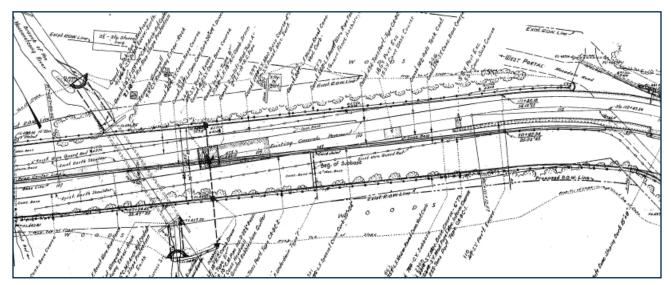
New road alignment shifted to the south, stations 106+00 to 114+00.
